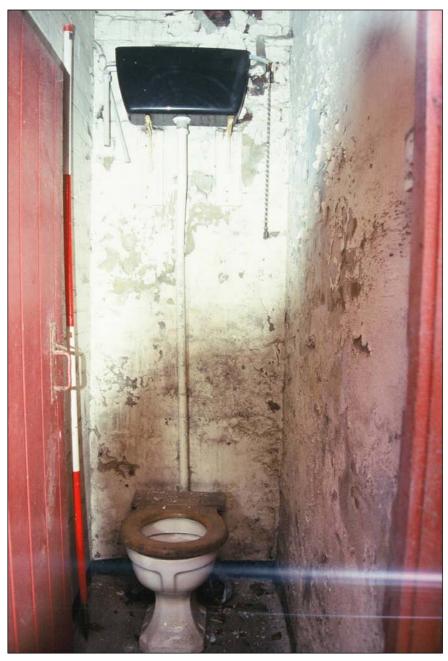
Detail of toilet cubicle and old toilet, G14 privies, wash house range (film C/S 2.12)
